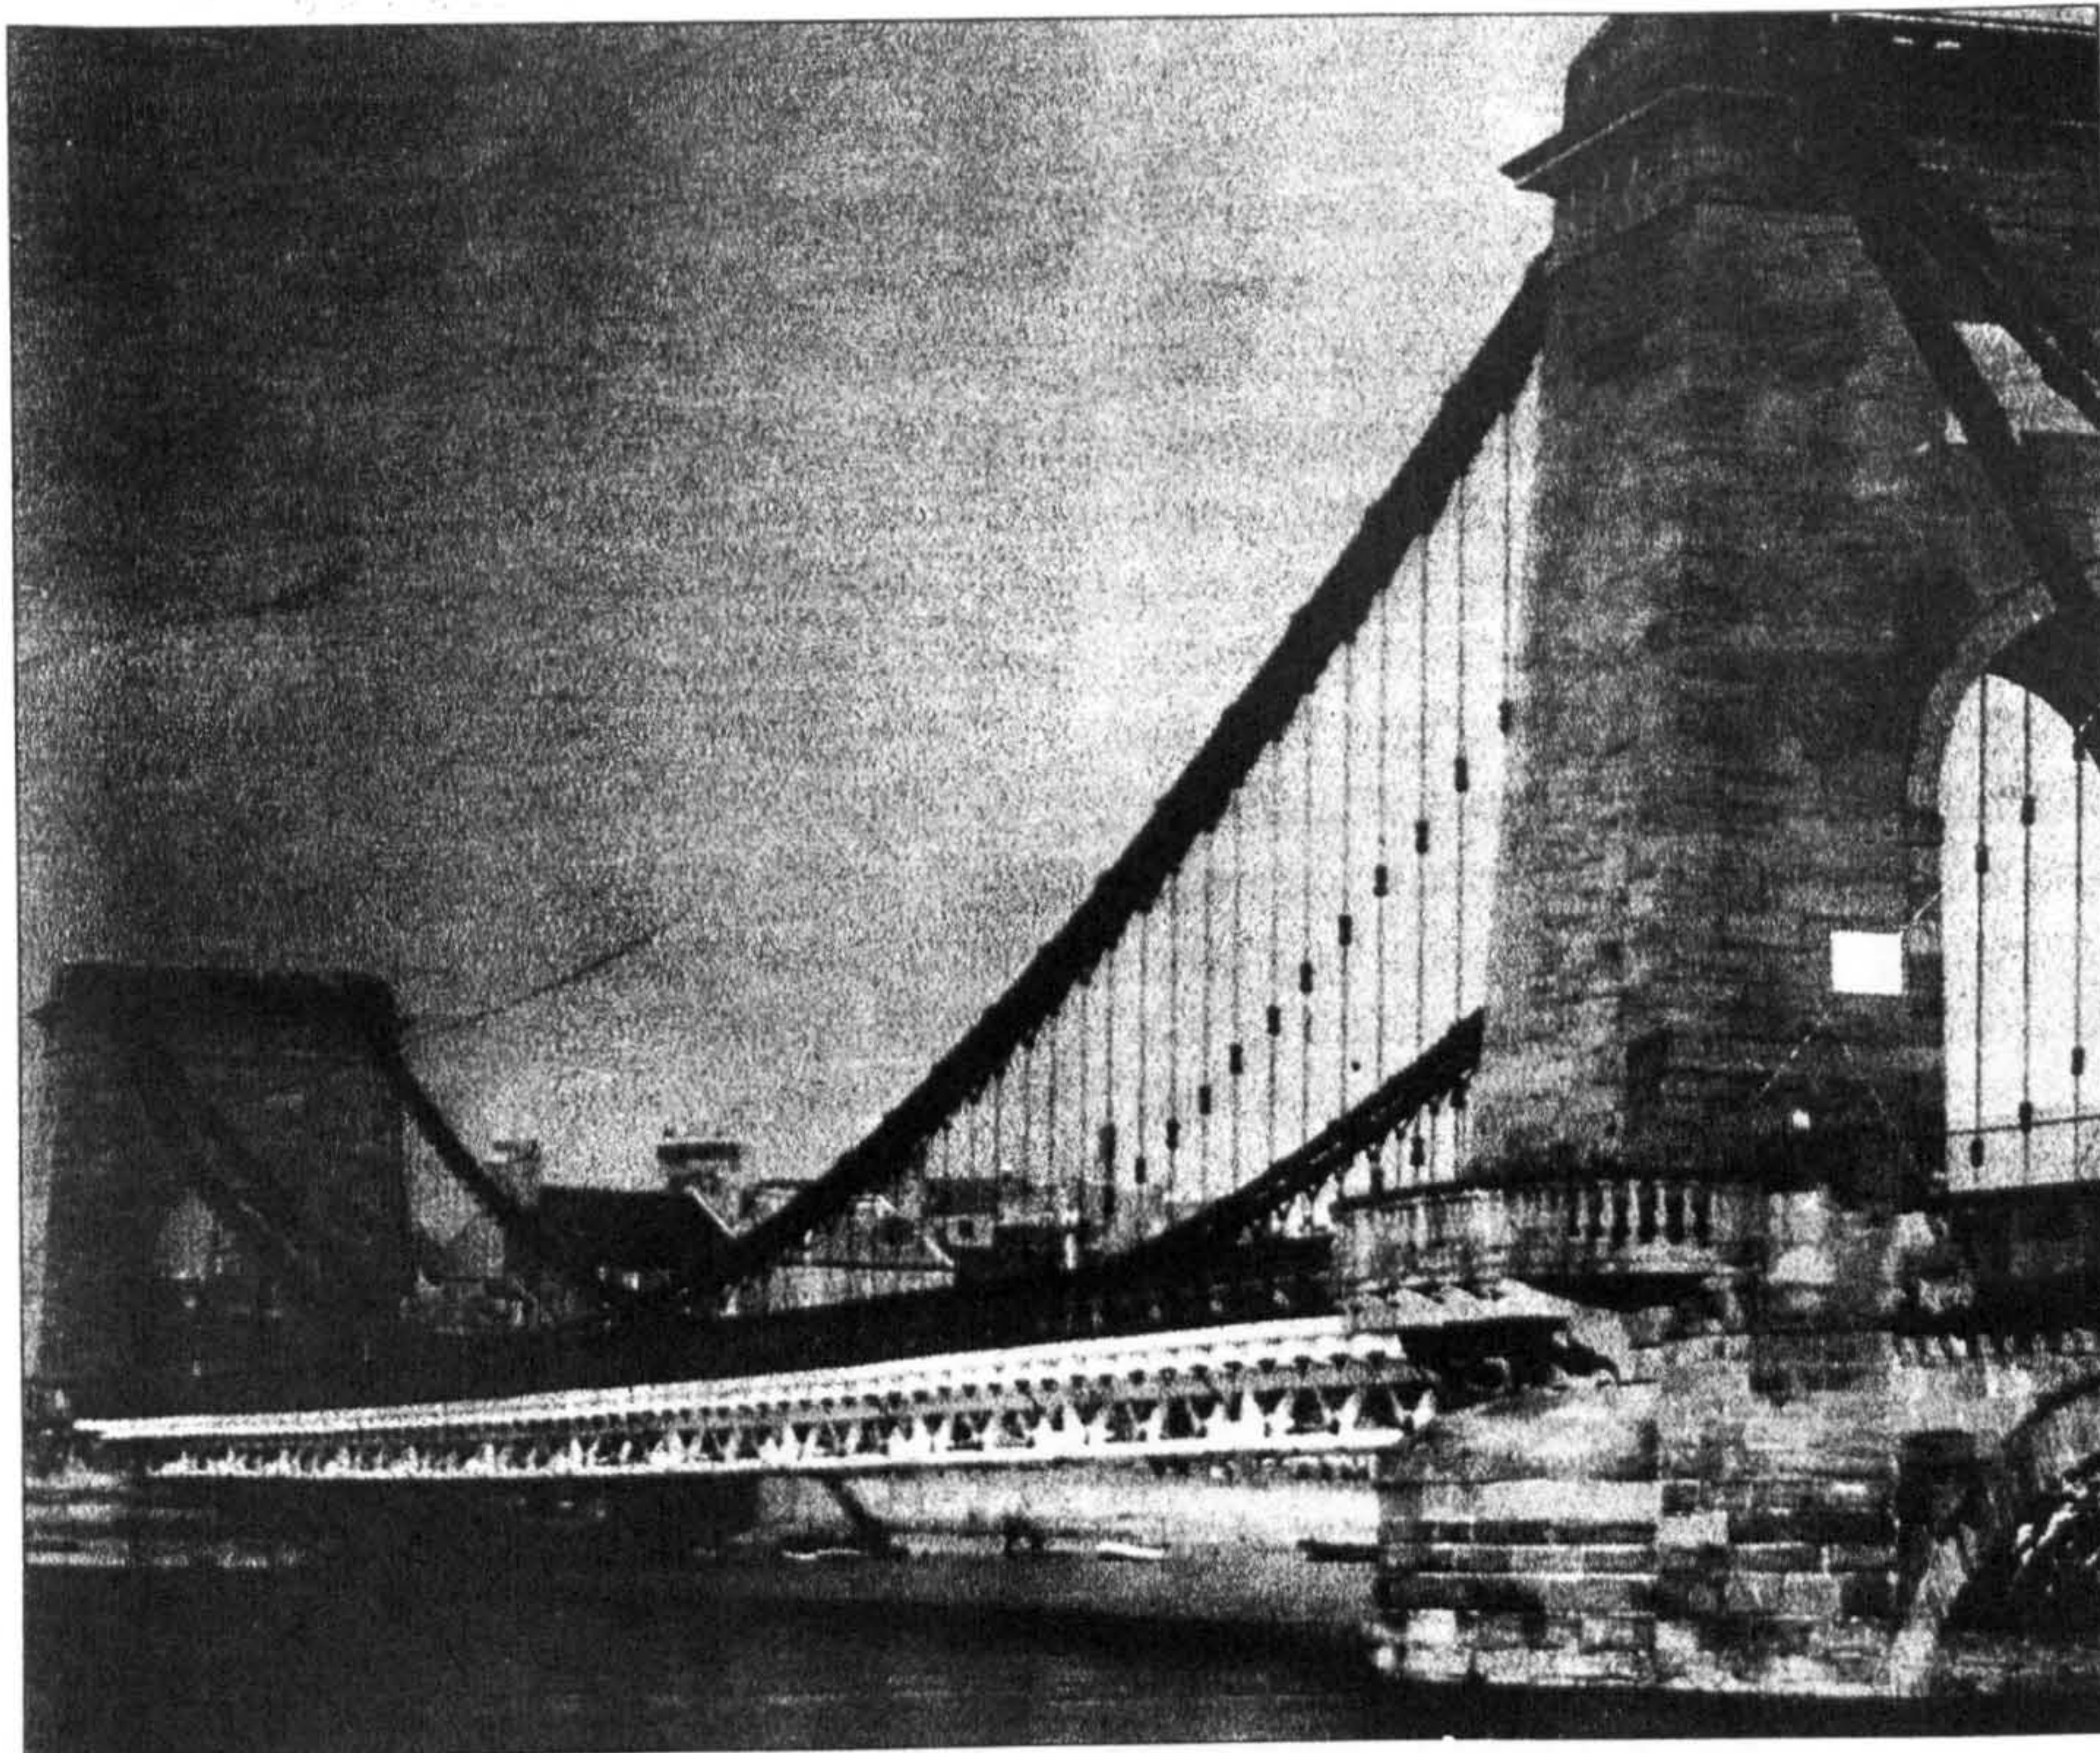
A Montrose Bridge 1826 - 1937. Timber trussing below deck level.
